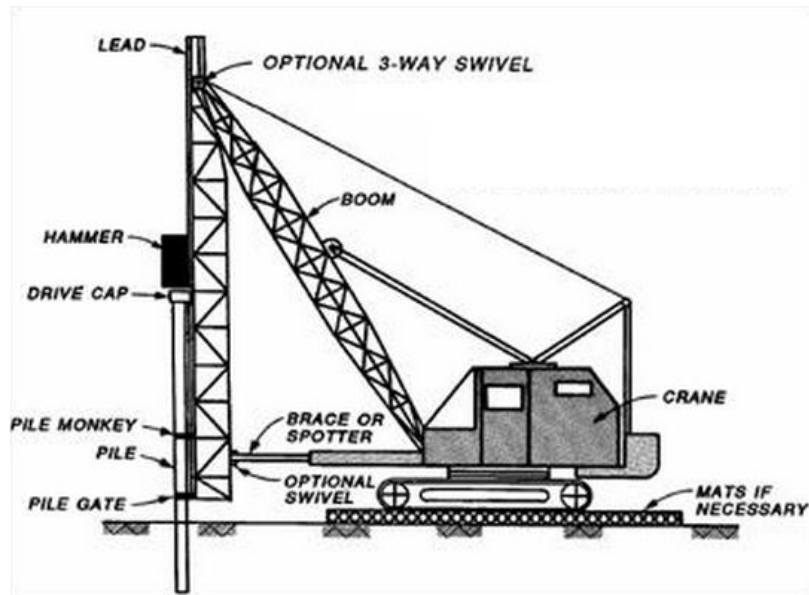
Typical pile driving rig using drop hammer for pile driving (Foundation Engineering, 2012)
